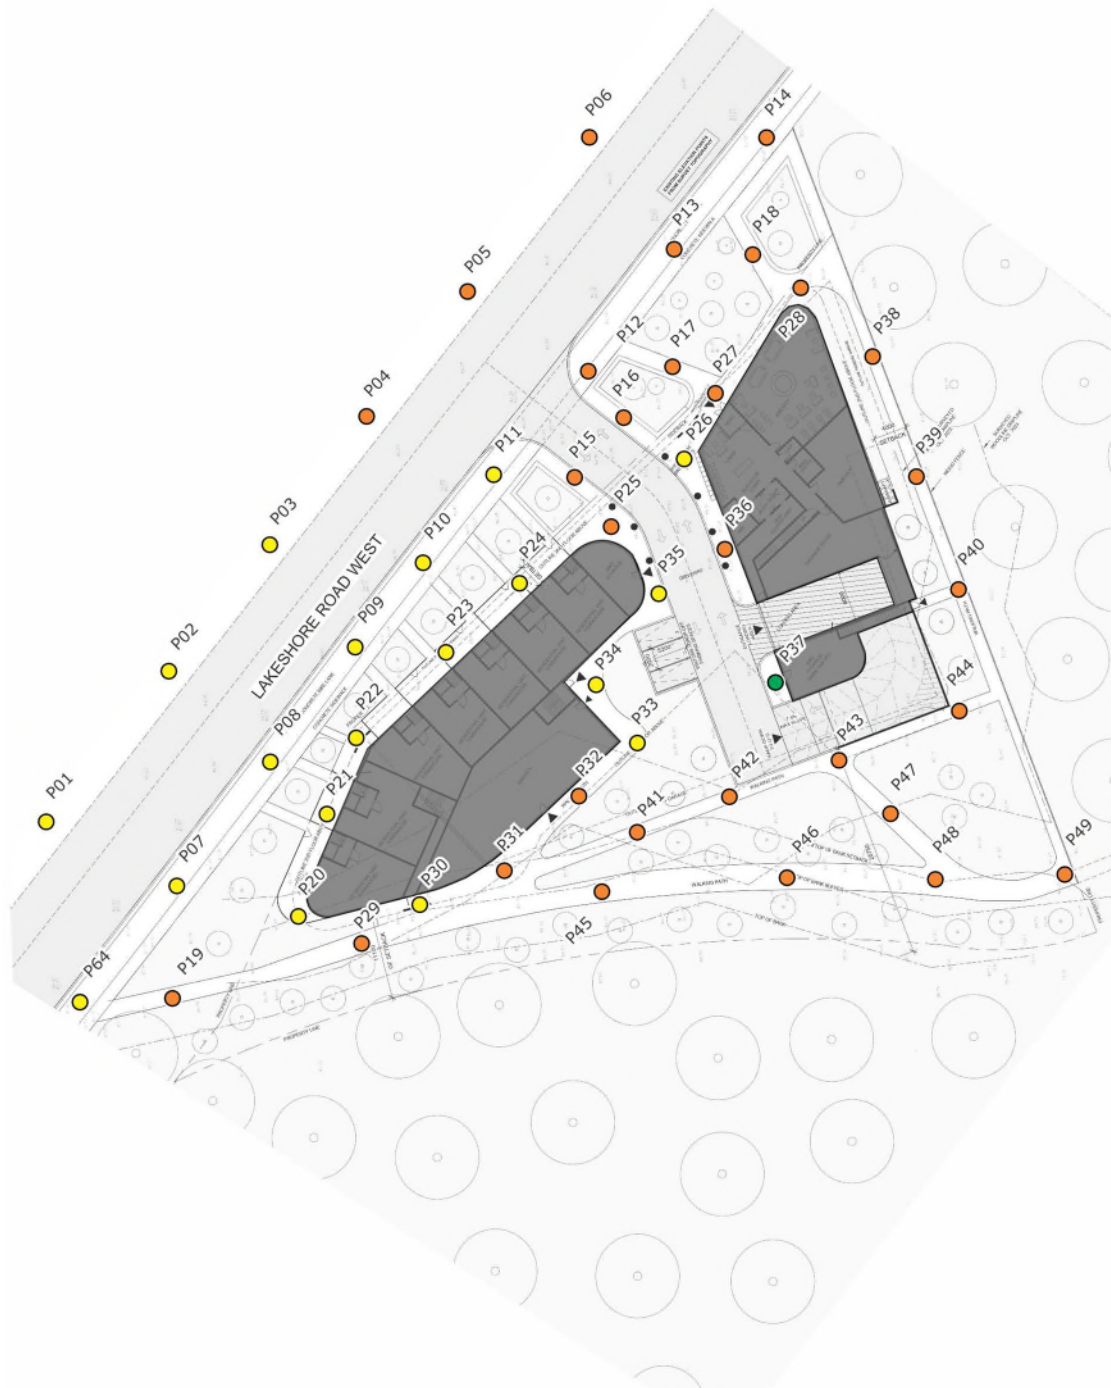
1c: Wind Tunnel Results – Existing Scenario – Winter – Ground Level Plan
